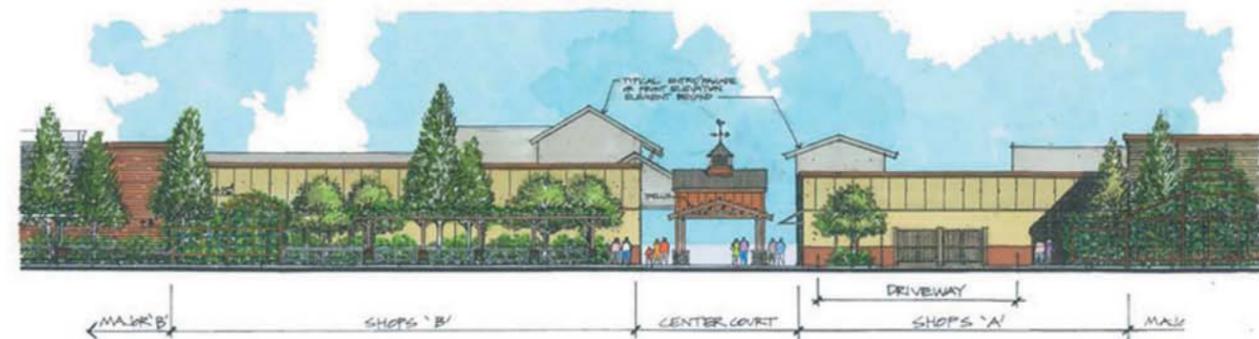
REAR ELEVATIONS, MAJOR TENANTS EAST
